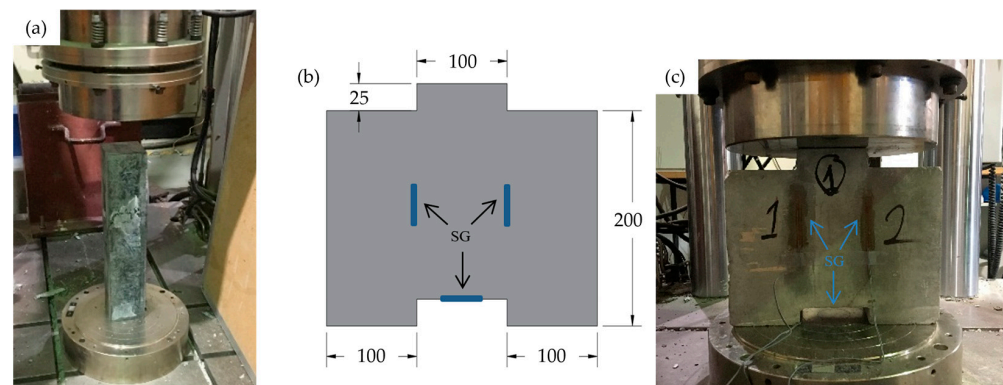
(a) Slant shear test performed on a prism sample in UTM hydraulic machine. (b) Direct shear sketch with dimensions (mm) and strain gauge positioning. (c) Direct shear test setup.
